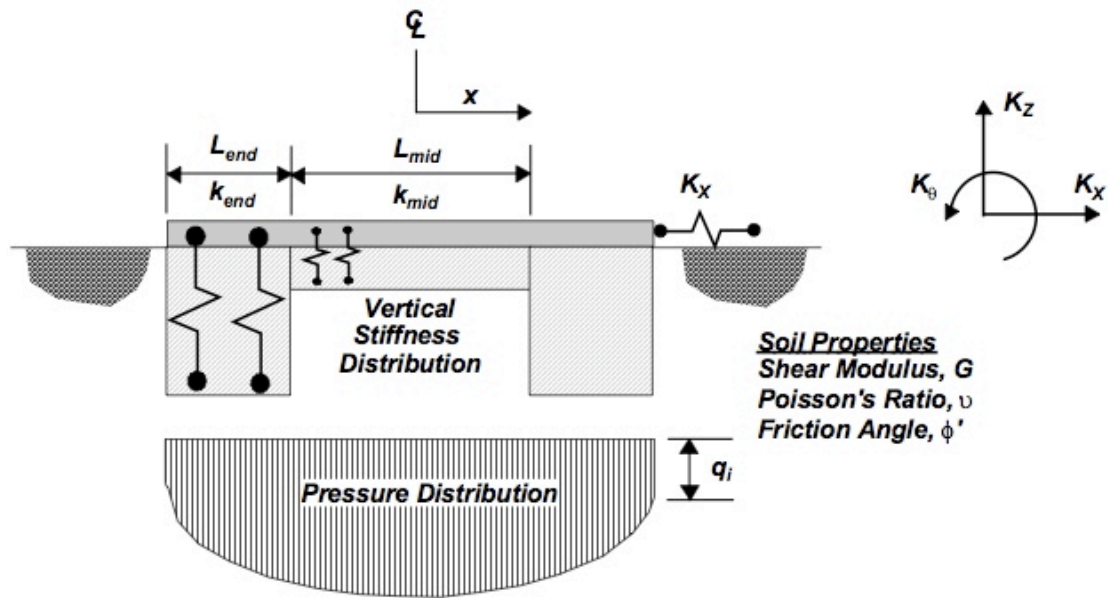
Nonlinear Winkler Foundation (Harden et al., 2005)
